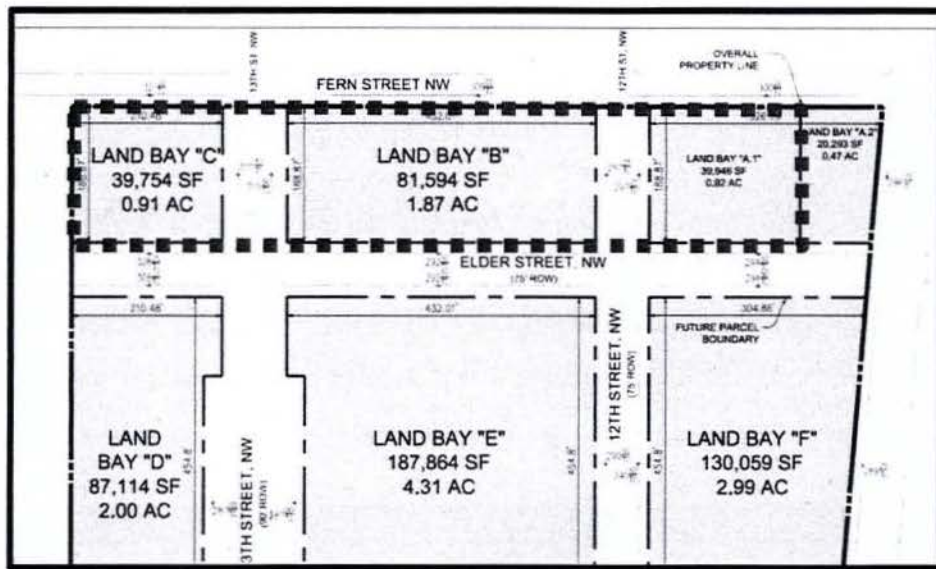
Fern Street Sub-Area Site Section. Source: Perkins+Will.
